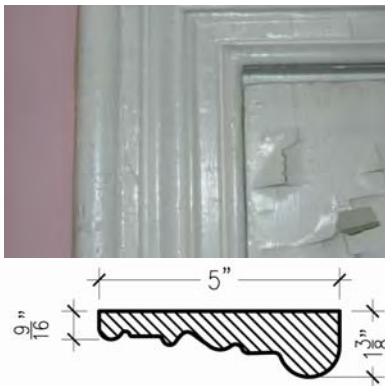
Door 204 case molding type-6 photo and profile. (Photo: BBB, 2006)
